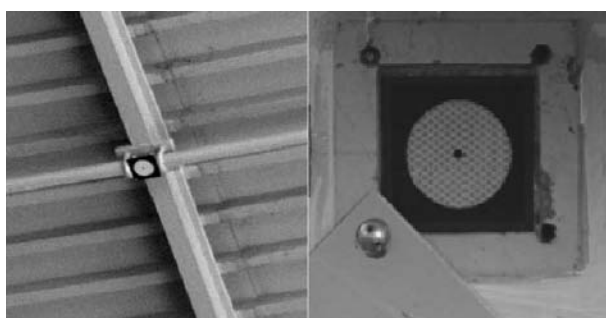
Constructed target attached to the construction of suspended roof as controlled point (left side) and on the abutment as control (right side)
